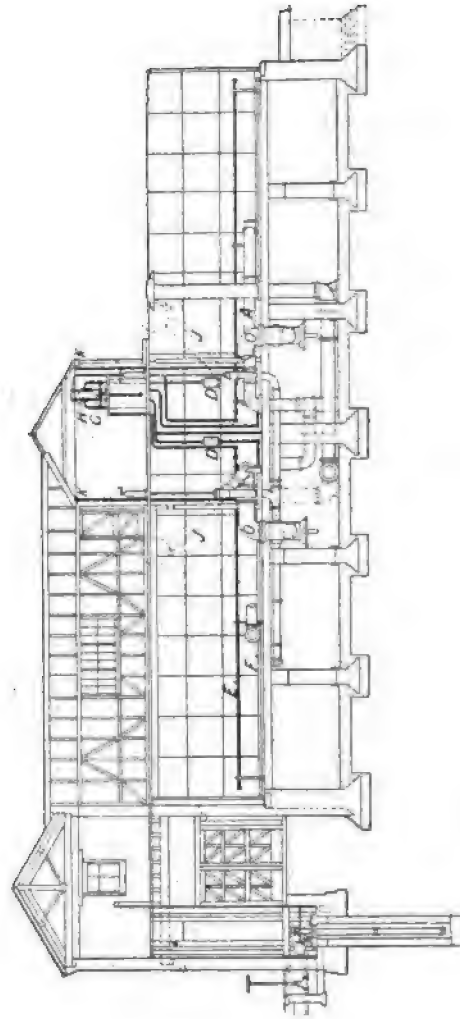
Water-Softening Plant at Ilkeston. (Transverse View.)
